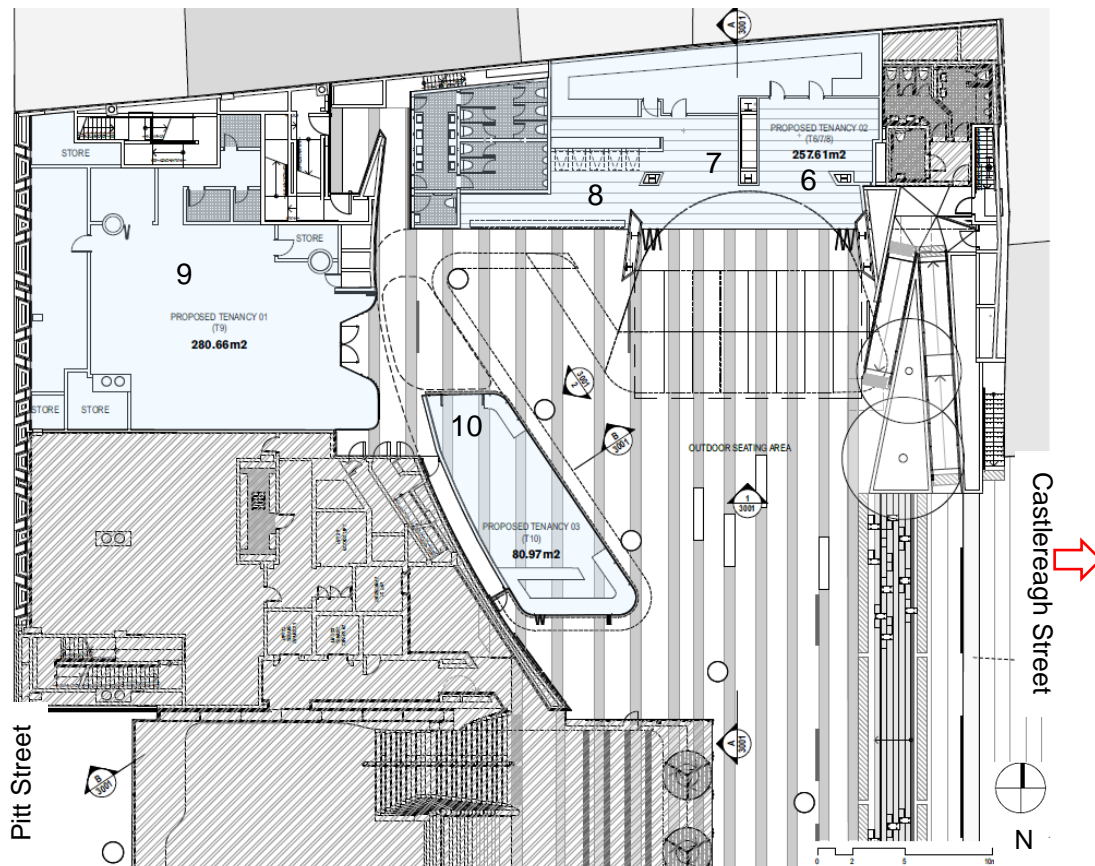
Proposed plan. Tenancy numbers also labelled on plans.
